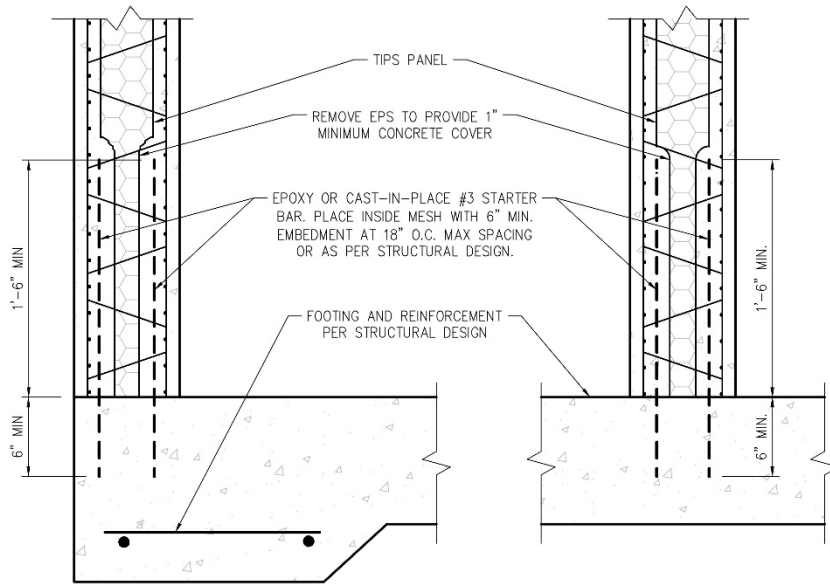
TIPS PANEL SPLICE - ELEVATION AND SECTION VIEWS
